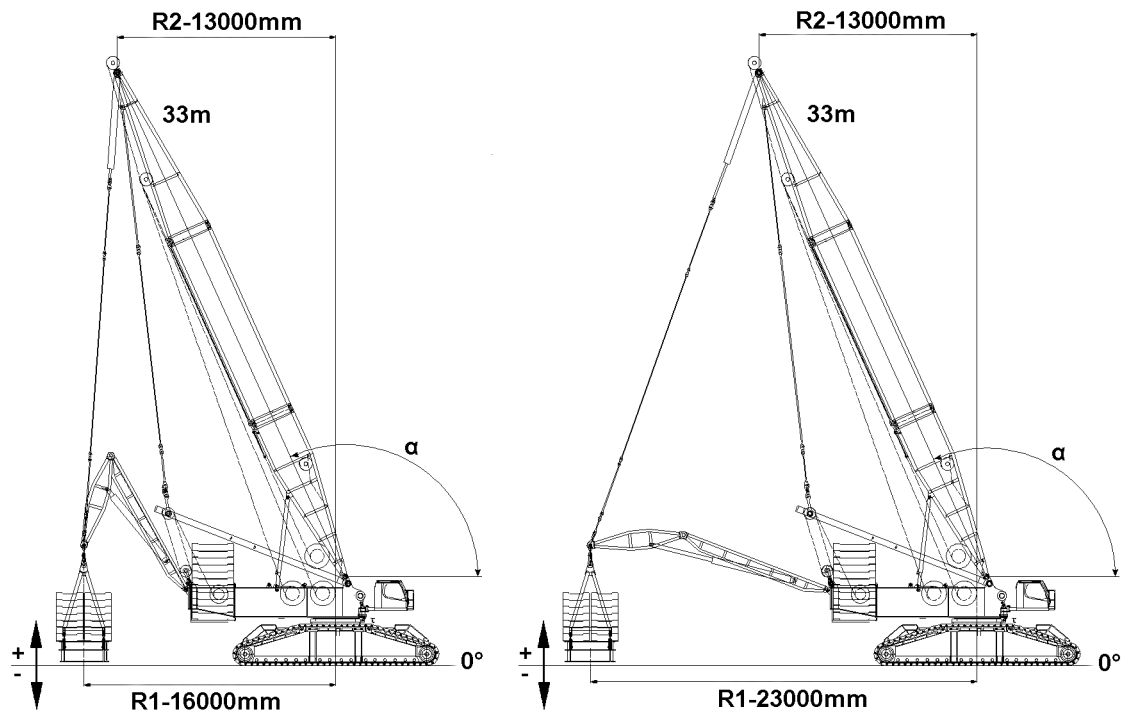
Derrick ballast with suspended ballast guide “V-frame” – derrick boom 33 m
